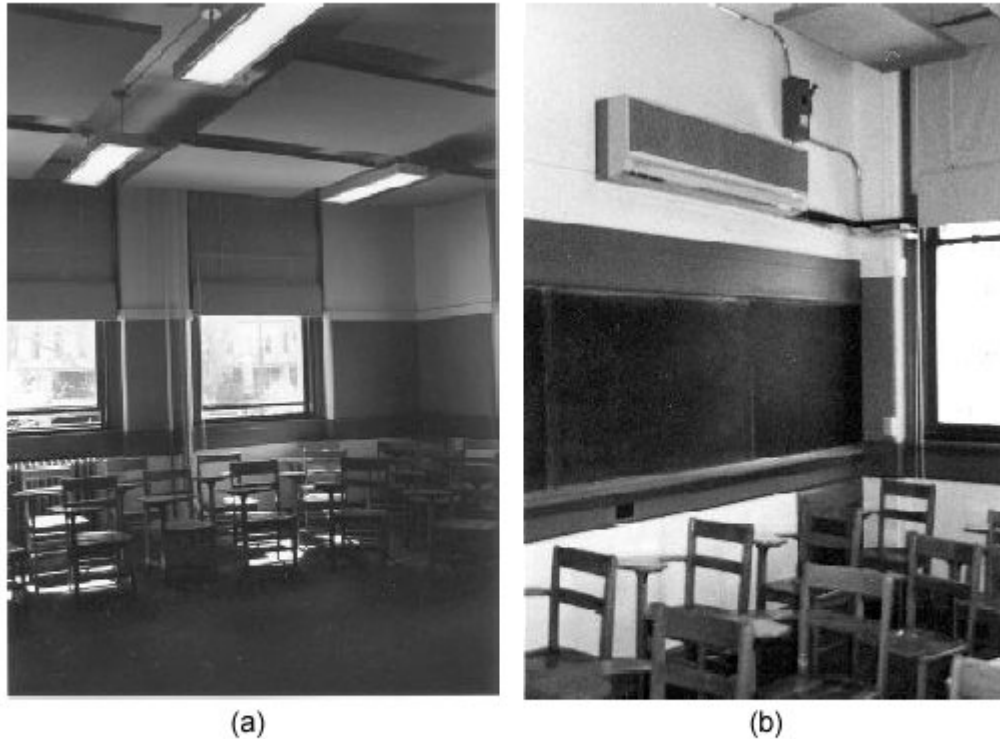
Older Classroom Improvements Photograph (a) shows the added sound absorptive material in the form of hanging fabric faced glass fiber panels, wall mounted fabric faced glass fiber panels and carpeting. Photograph (b) shows the relatively noisy wall mounted air conditioning unit with two fan speeds.
